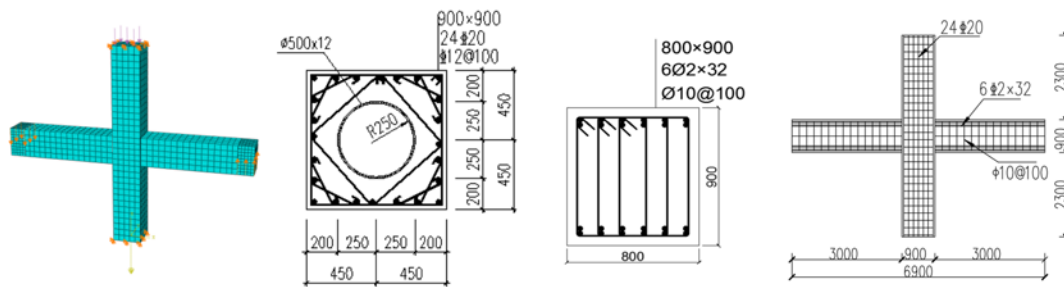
Dimensions and Finite Element Models of CFSTLC Beam-column Joint (Unit: mm)
